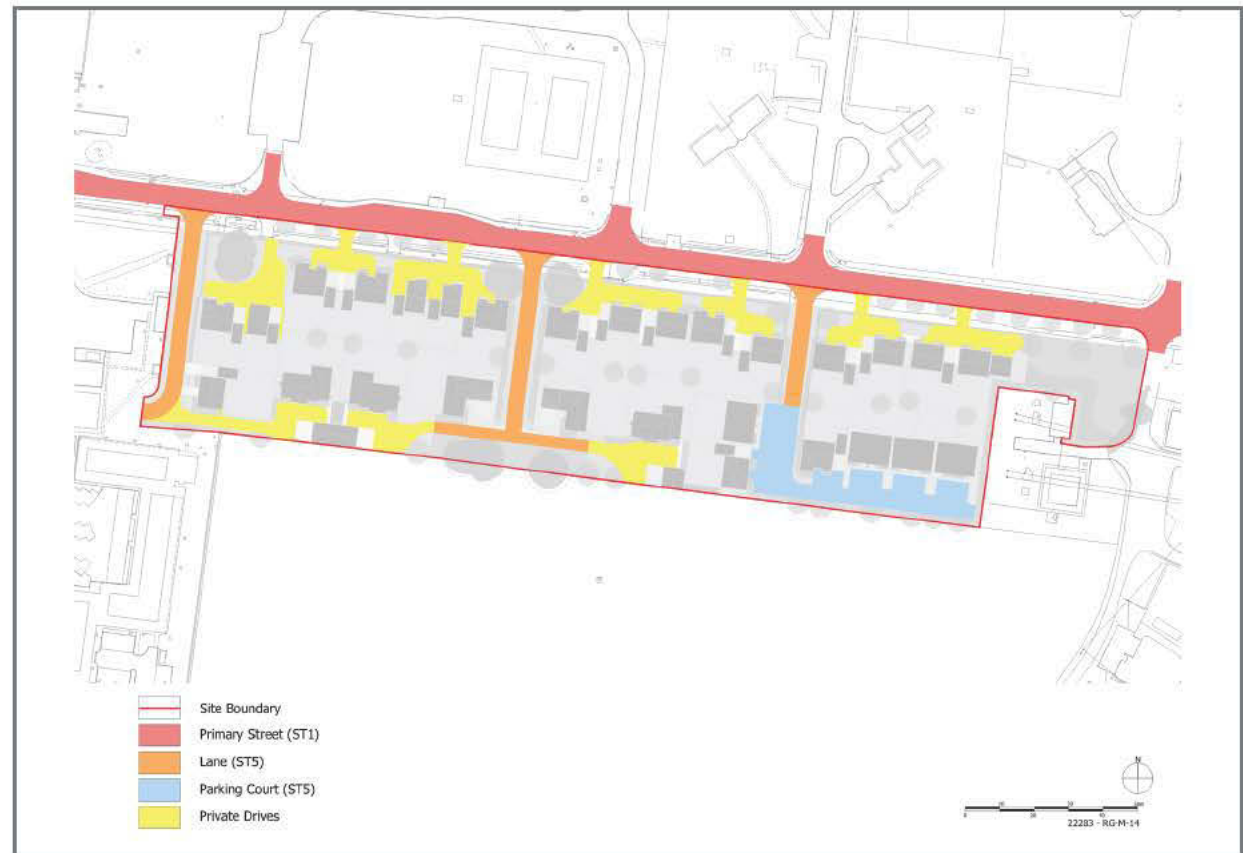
PROPOSED STREET HIERARCHY PLAN
